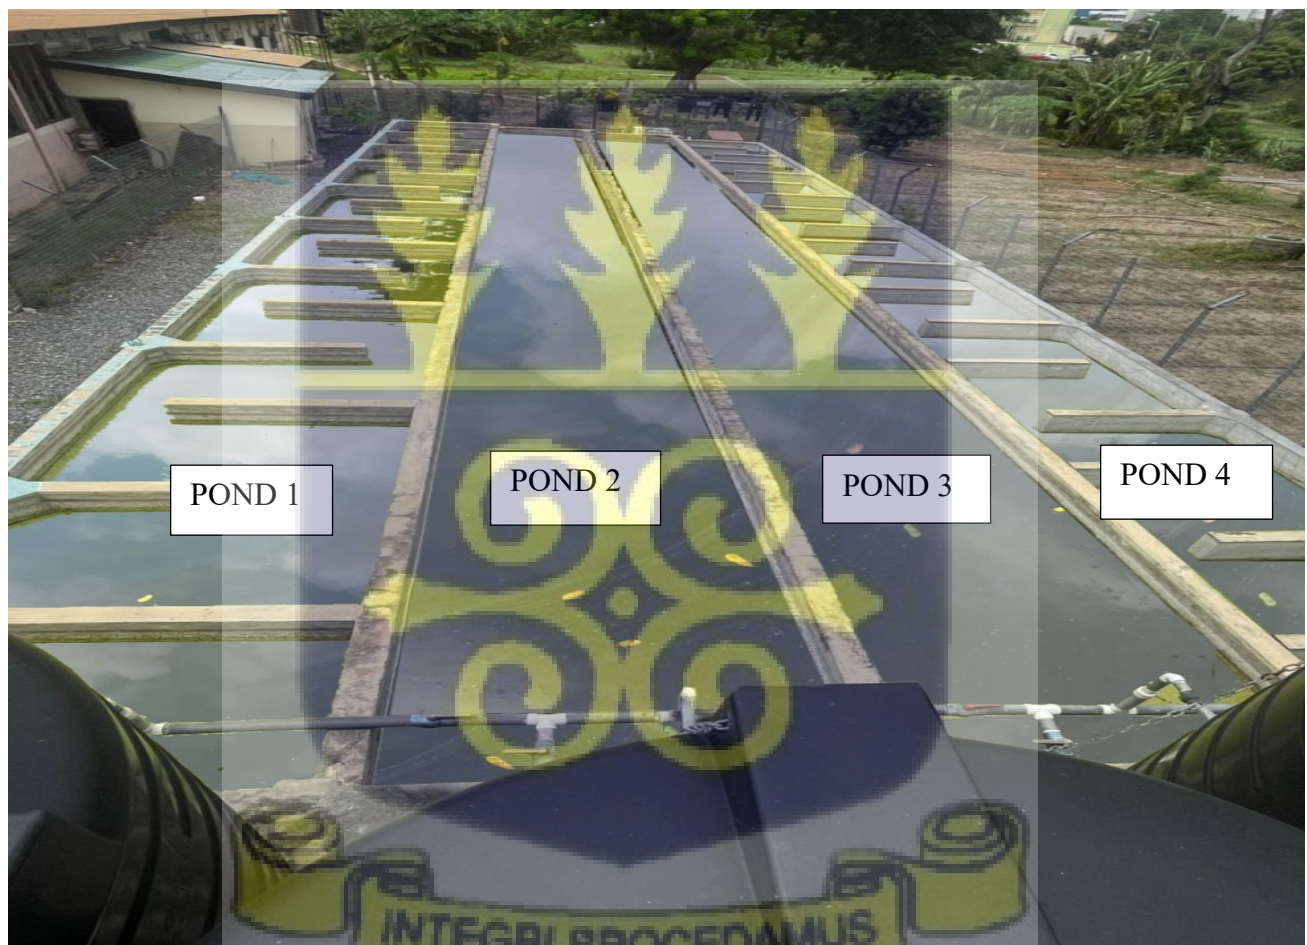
Pond layout for wastewater stabilization and storage for irrigation at WRI.
